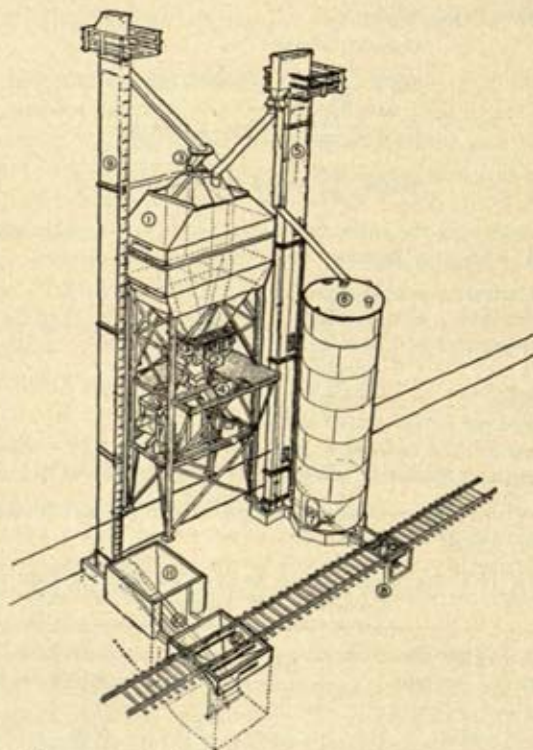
Layout for a central mixing plant. (*Construction Methods and Equipment.*)
